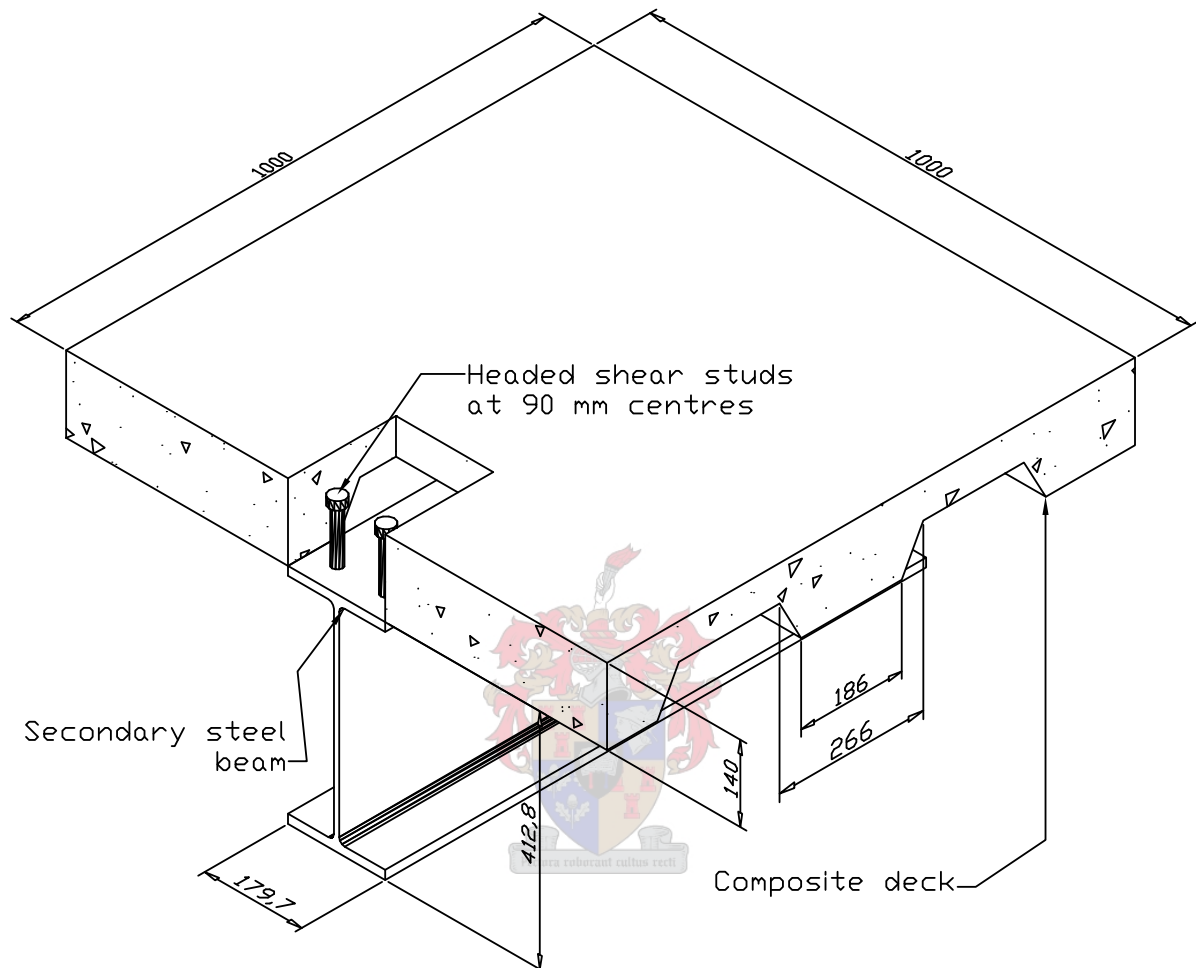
Section of unit length and unit width through a secondary composite beam
